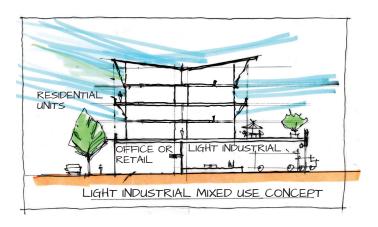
Example of a light industrial and residential mixed use building, showing how residential units might be set back from the loading areas.
